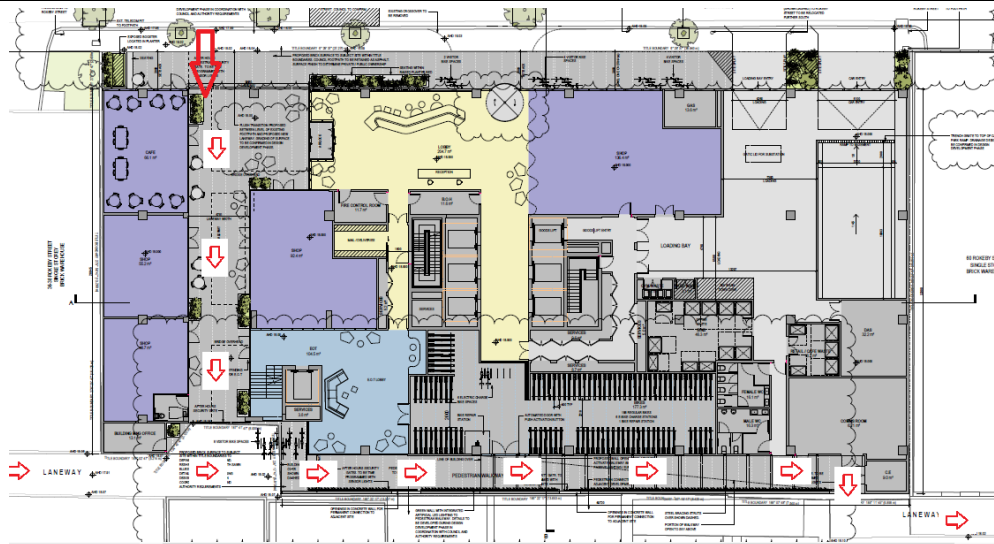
Ground floor plans with publically accessible line of travel delineated.
